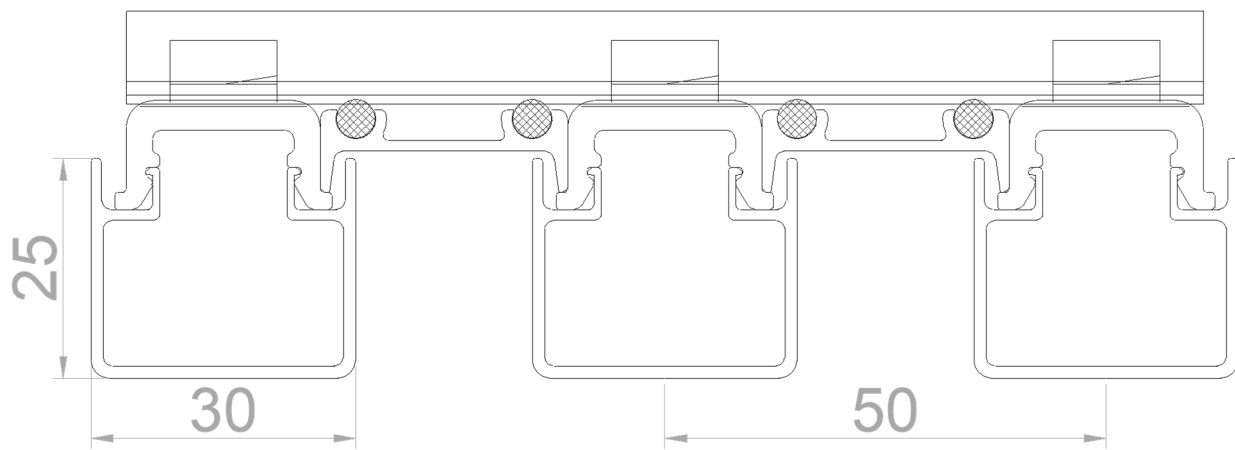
Docking system detail _Battens 30/2 - 30/3 - 30/4
